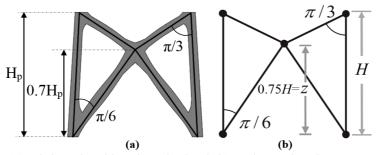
(a) High-waisted bracing obtained (b) optimum bracing geometry [15].
